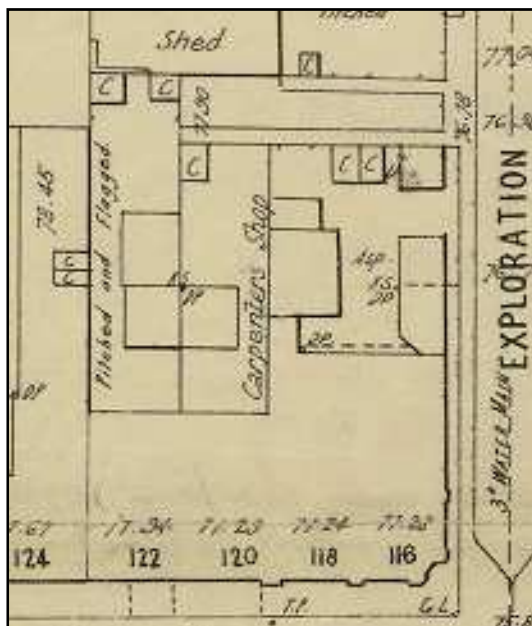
MMBW Detail Plan 1896, hotel as 116-118 but contiguous with 120-122 Little Lonsdale St
